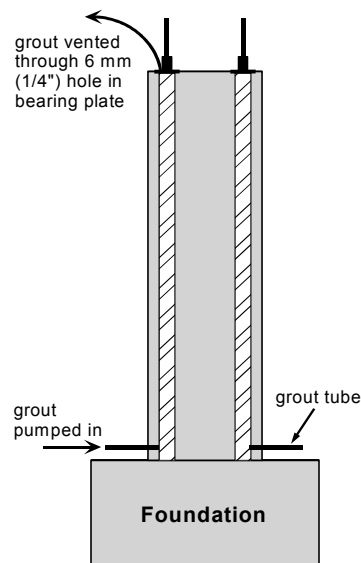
Inlet and Vent for Grouting.^{5.1}
